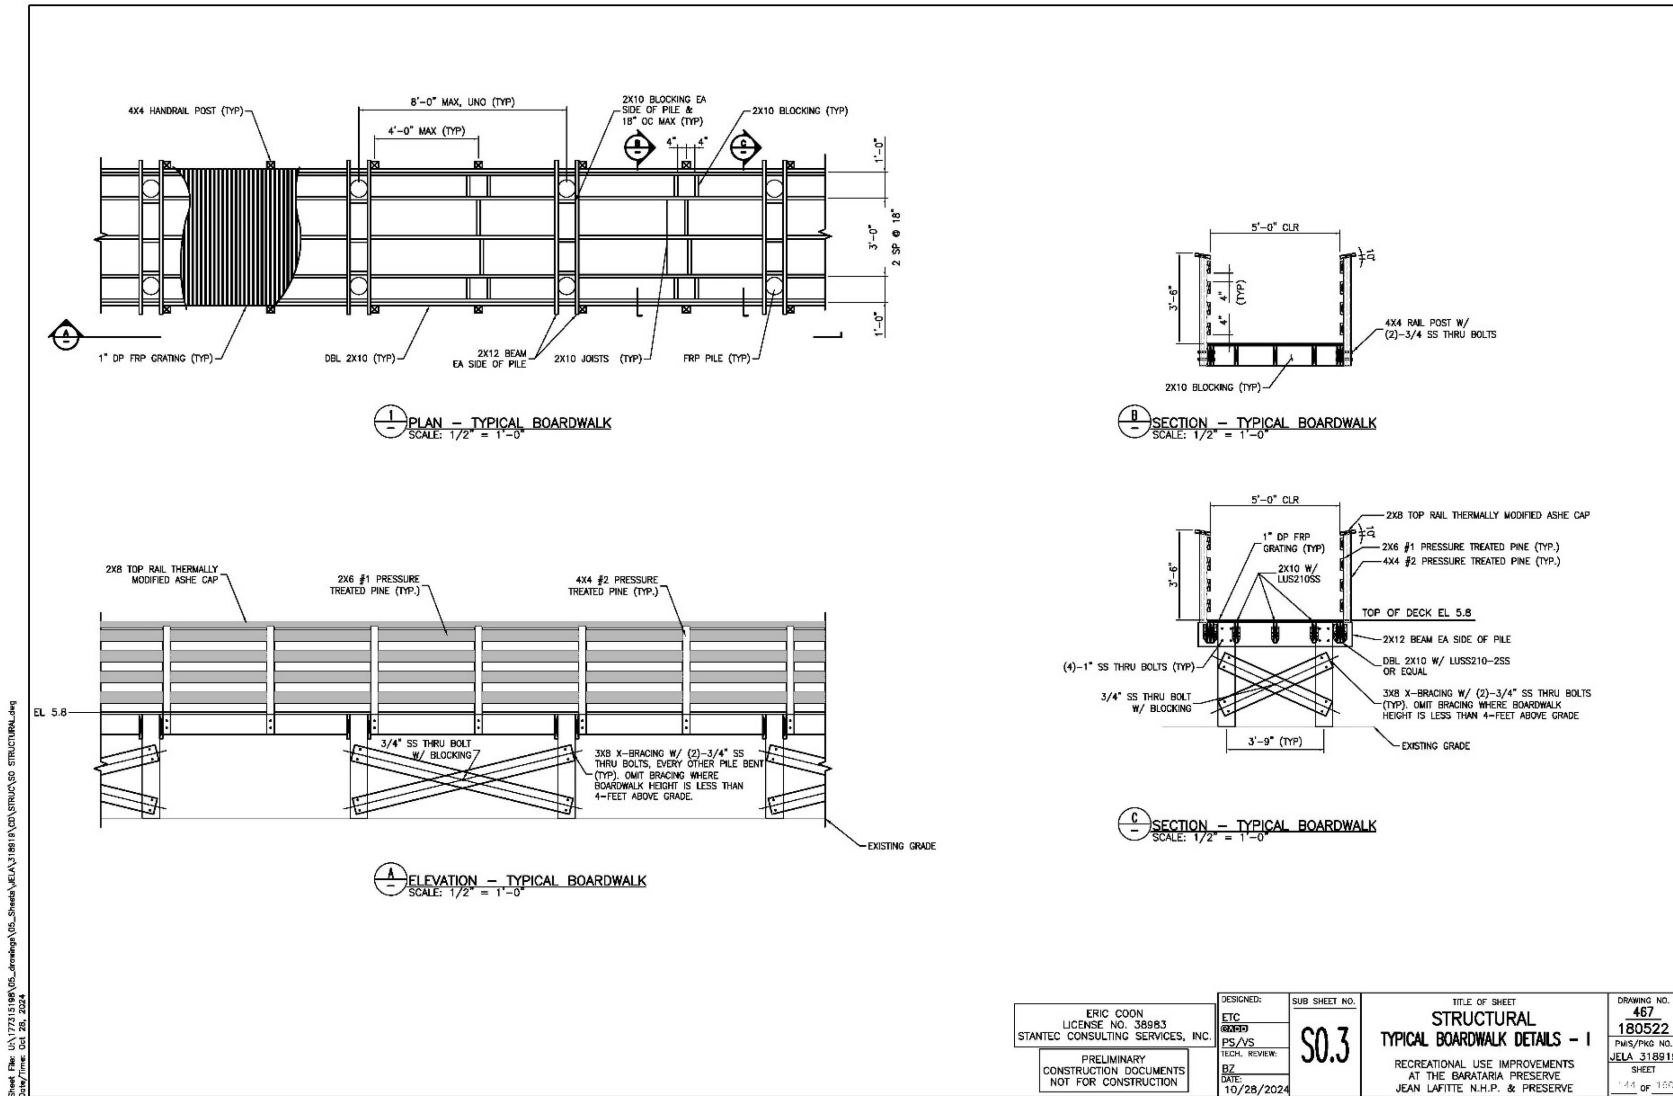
Typical Boardwalk Details (Construction Design dated 10/28/2024)
